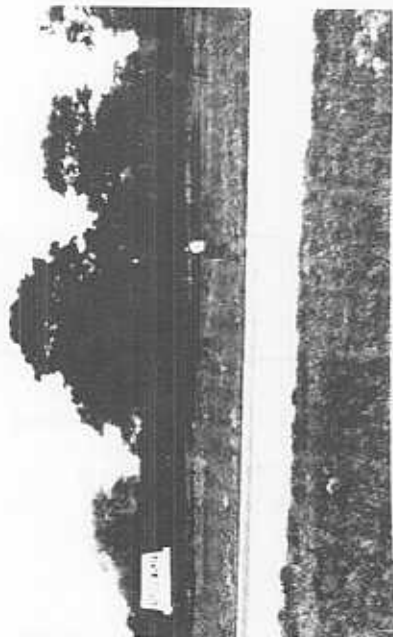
SITE NO. 5. LAKE WALES FLORIDA
